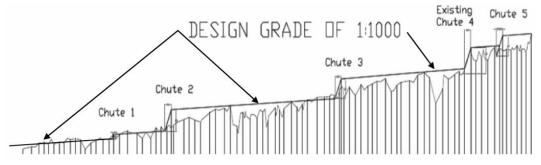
Noname Creek longitudinal profile and functional design rock chute layout
